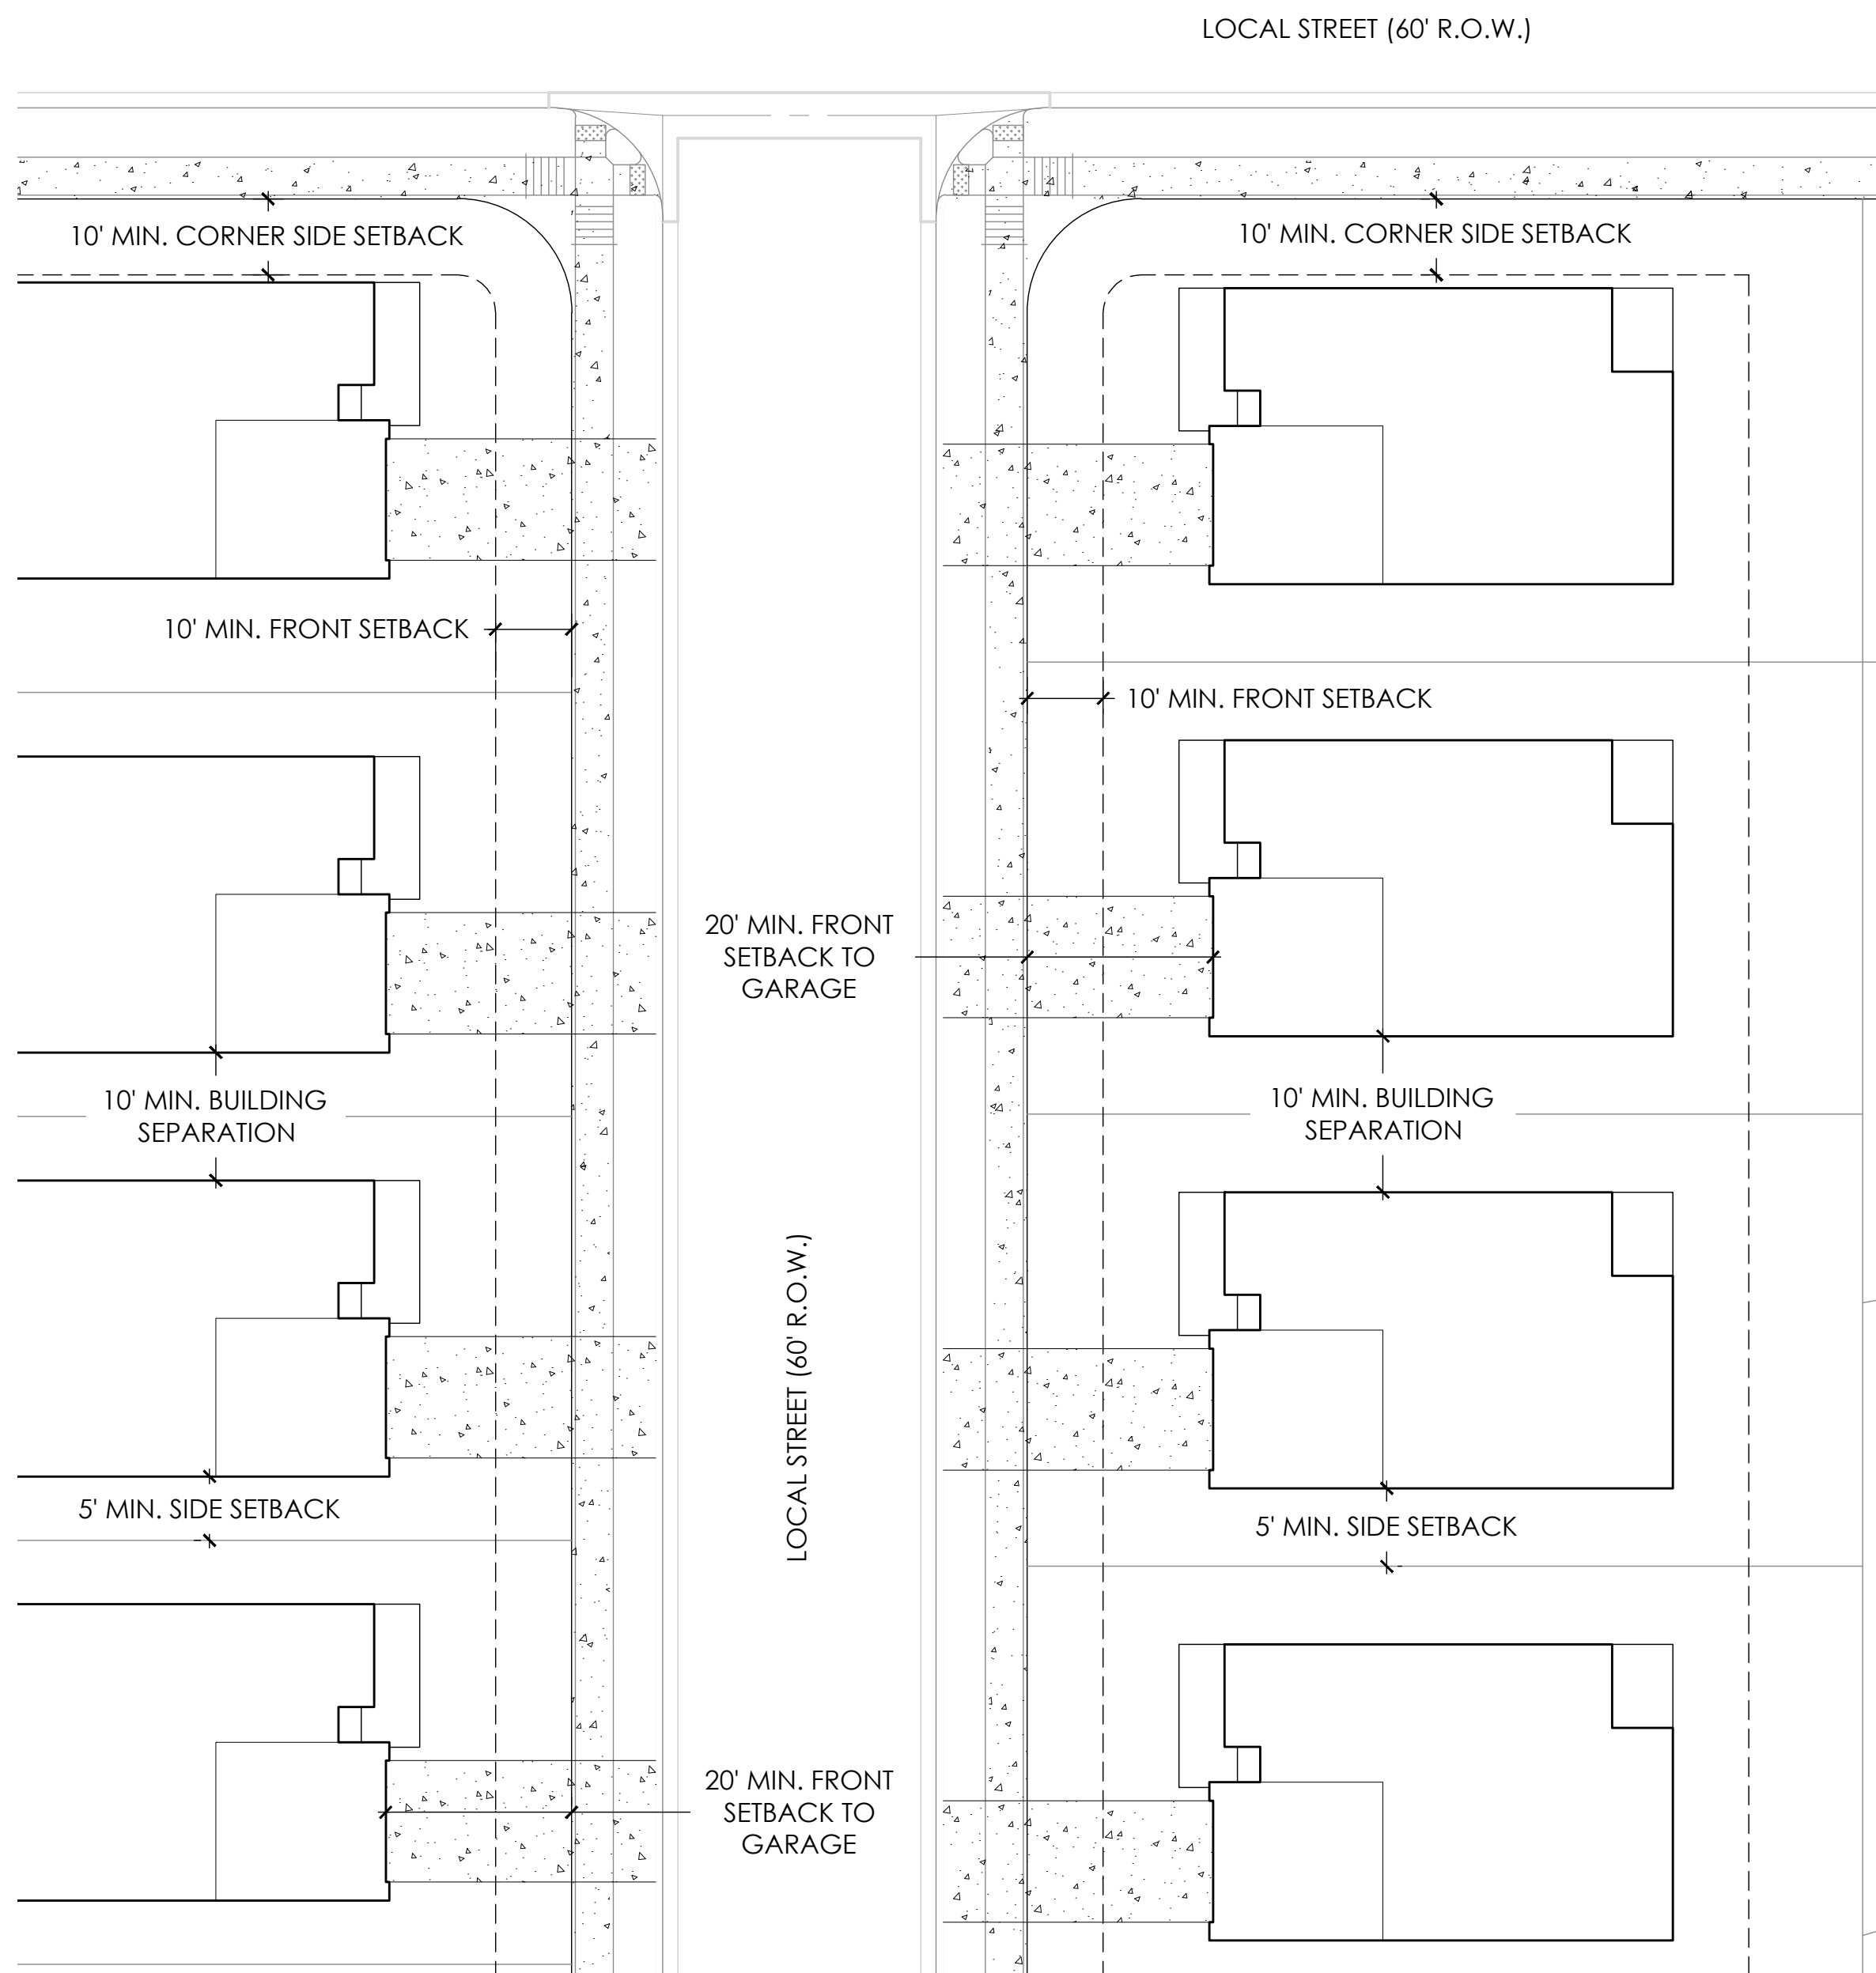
EXHIBIT A - SINGLE FAMILY DETACHED LOT TYPICAL
